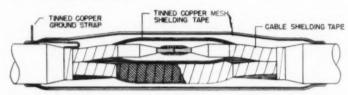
Straight joint for multi-conductor, rubber-insulated, shielded, non-metallic-sheathed cable.
